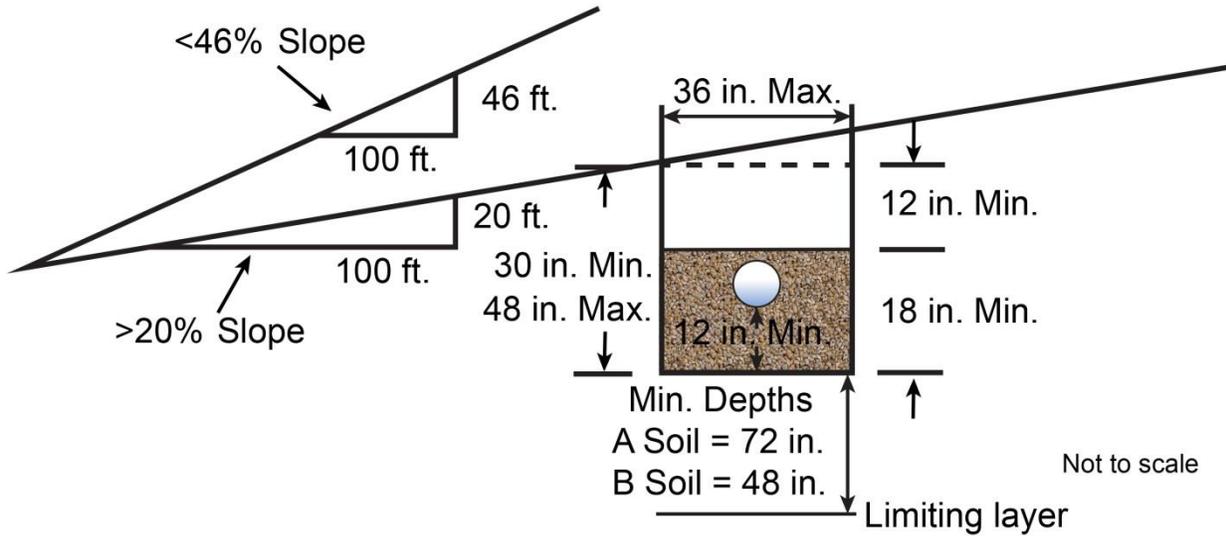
Illustration of a steep slope trench with an example of maximum and minimum slope.
